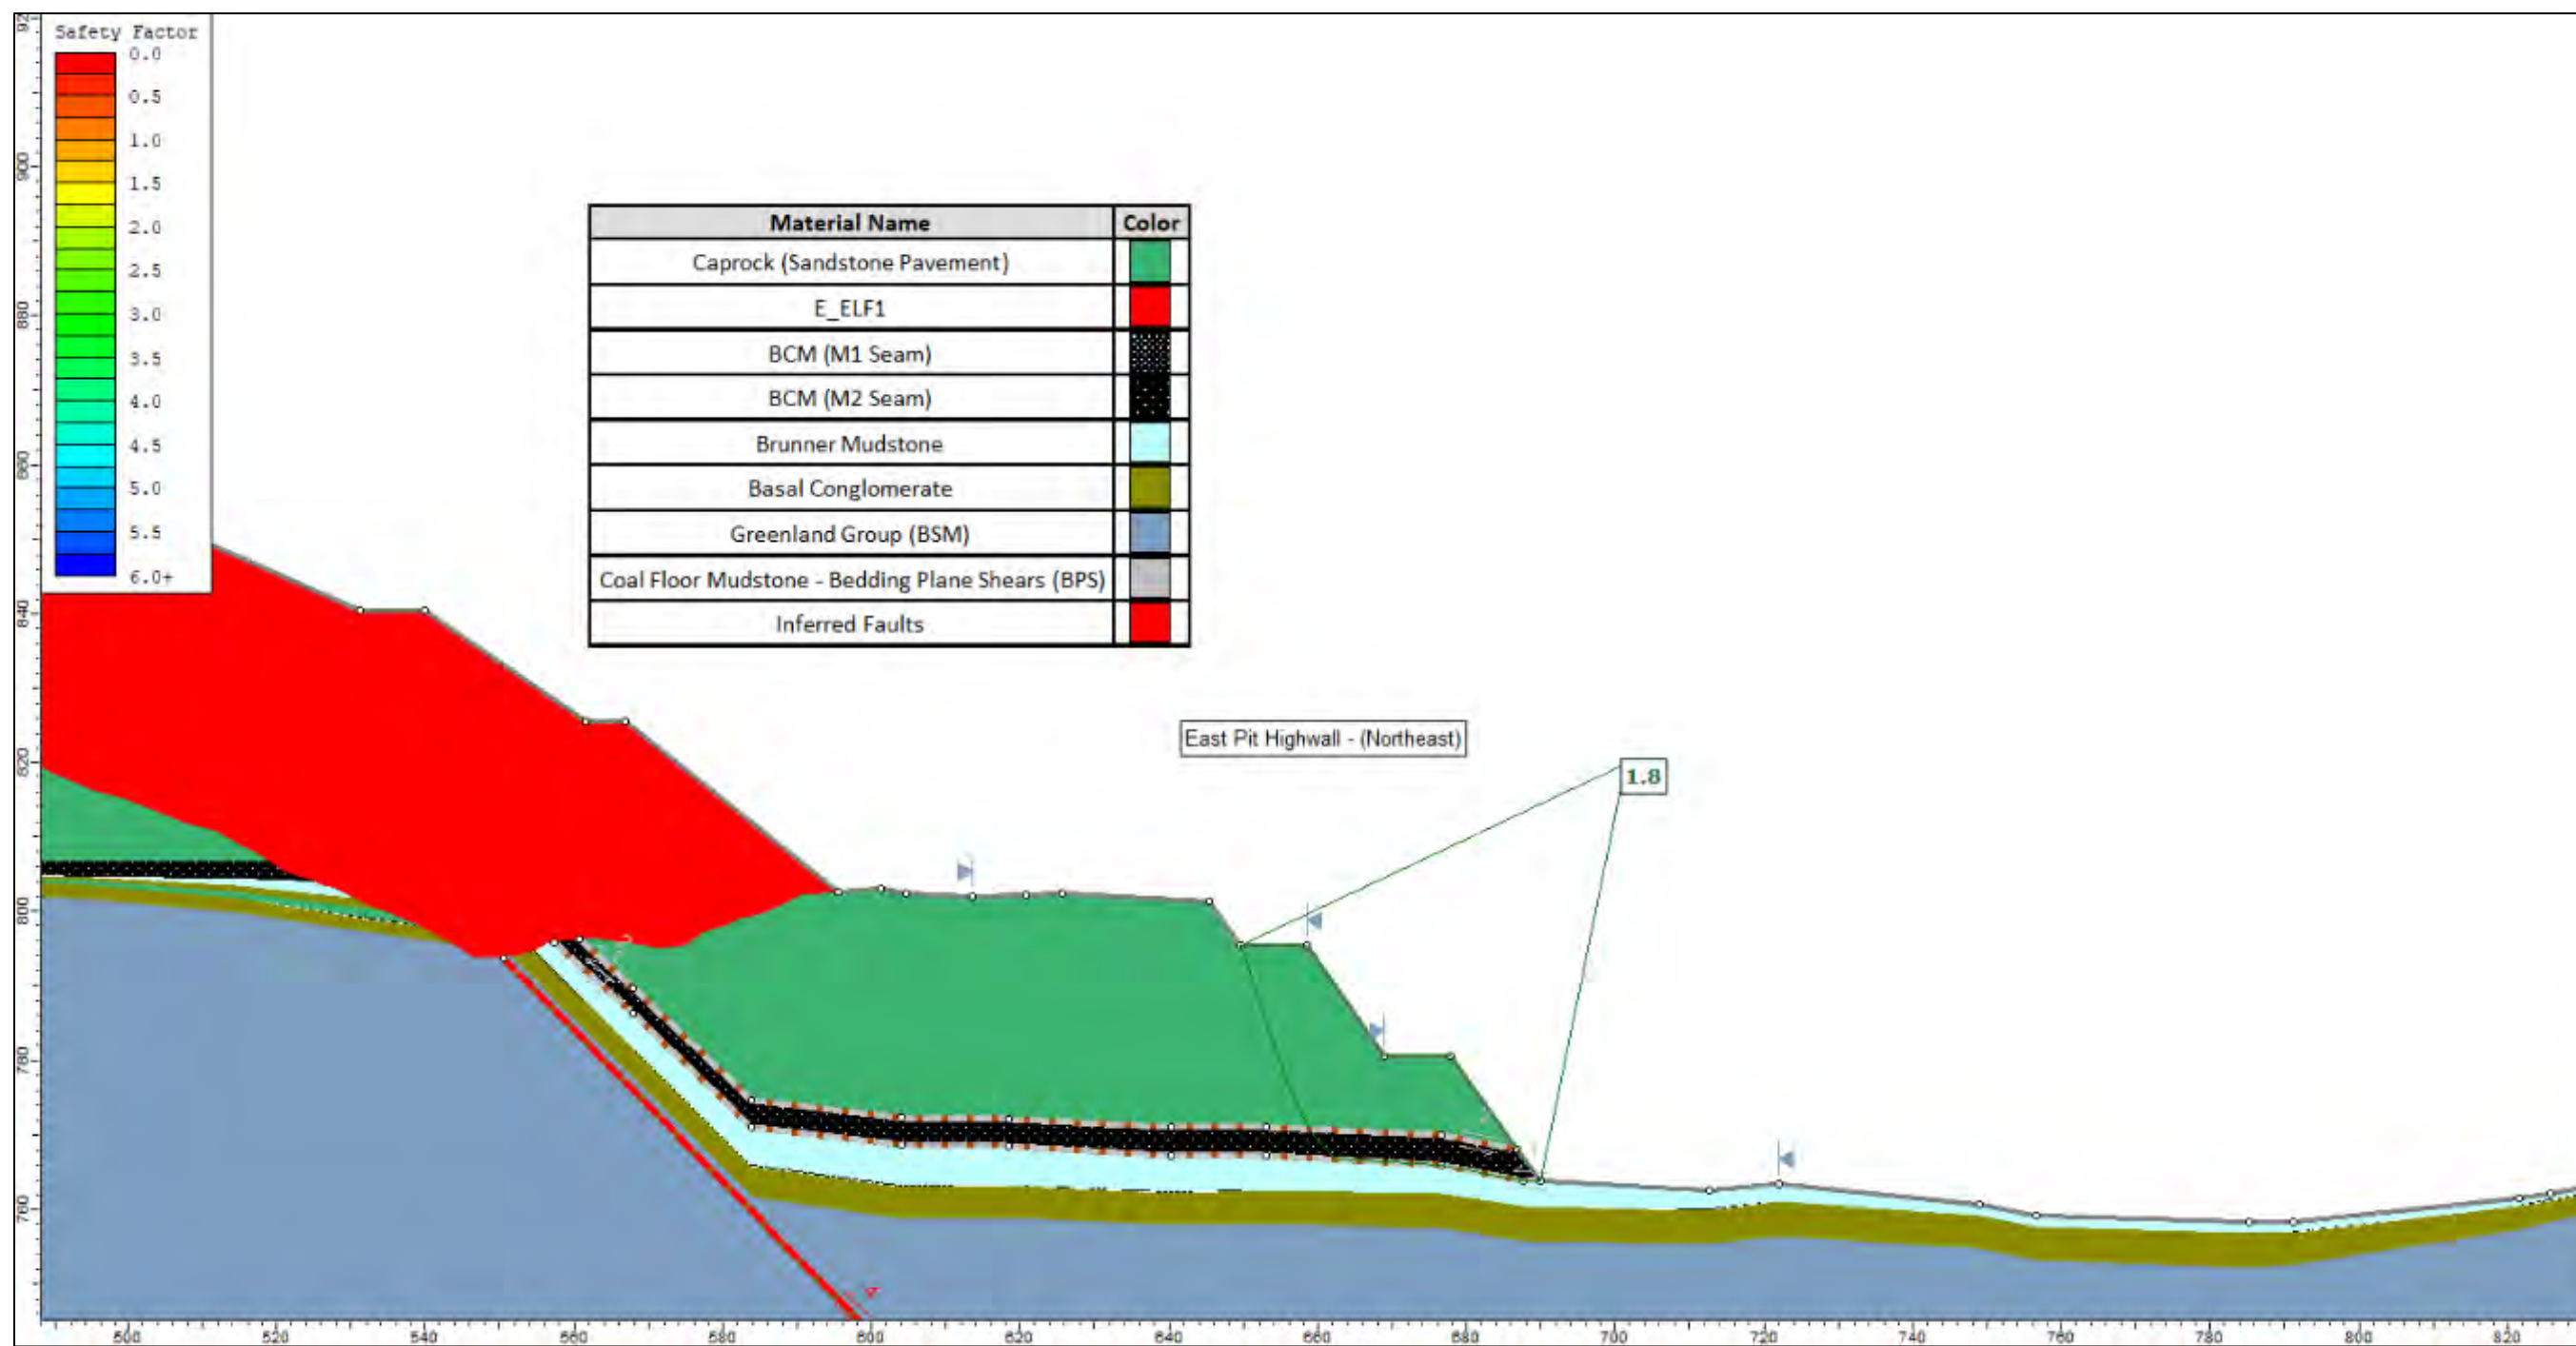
East Pit Highwall (Northeast) - Section 105 – Static Conditions.
